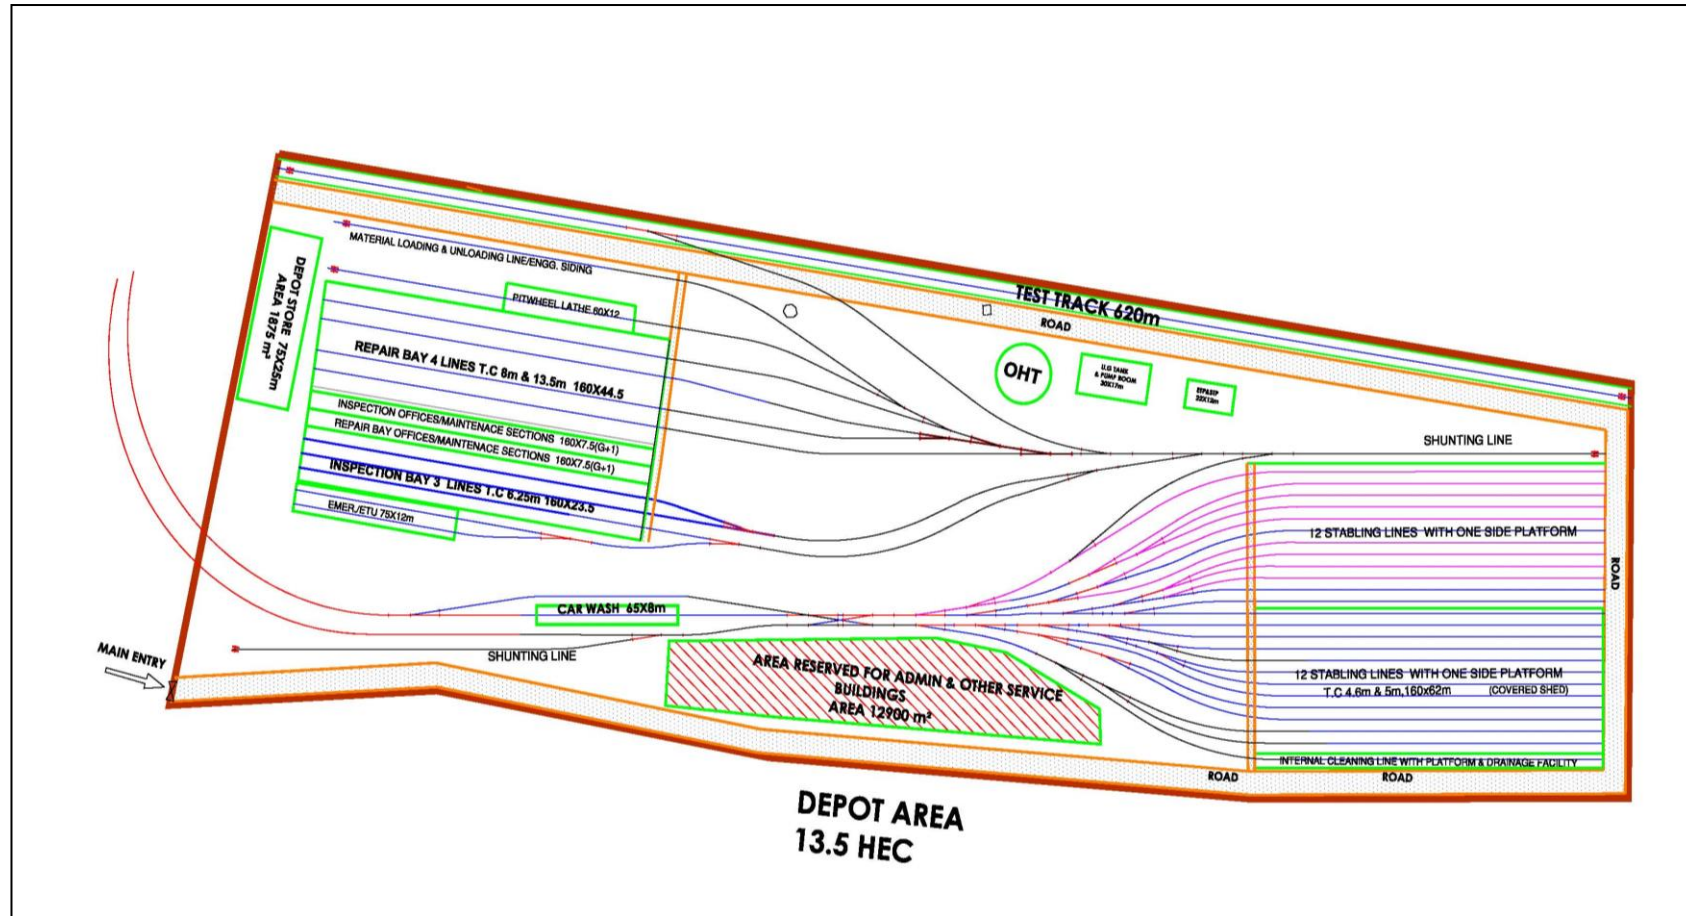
LAYOUT PLAN FOR POLY TECHNIC DEPOT (OPTION-2)
